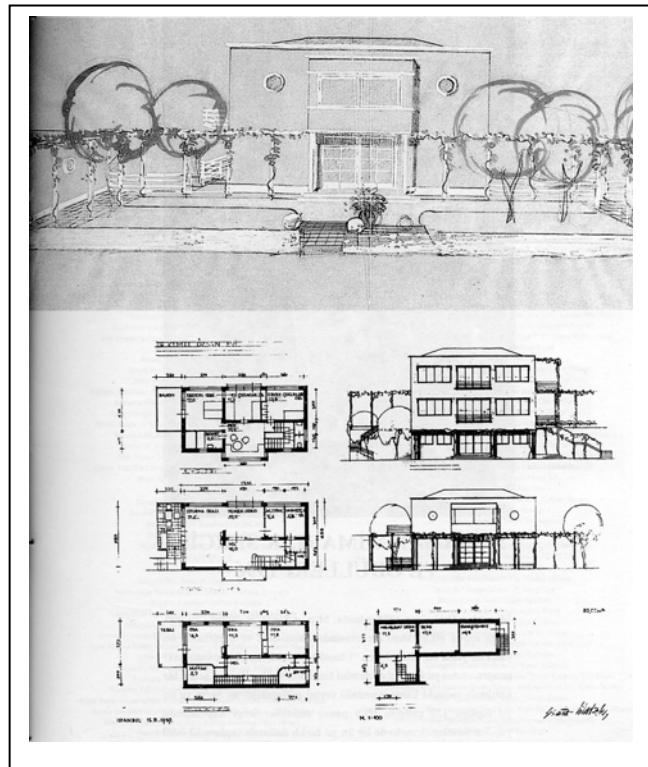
Plans and facades of the house for Dr. Kemal Özsan by Margarete Schütte-Lihotzky, İstanbul, 1939
